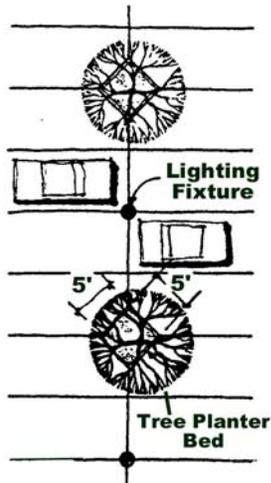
In mixed use and larger parking lots, tree planters can be 5' by 5' and alternated with smaller-scale lighting fixtures.
